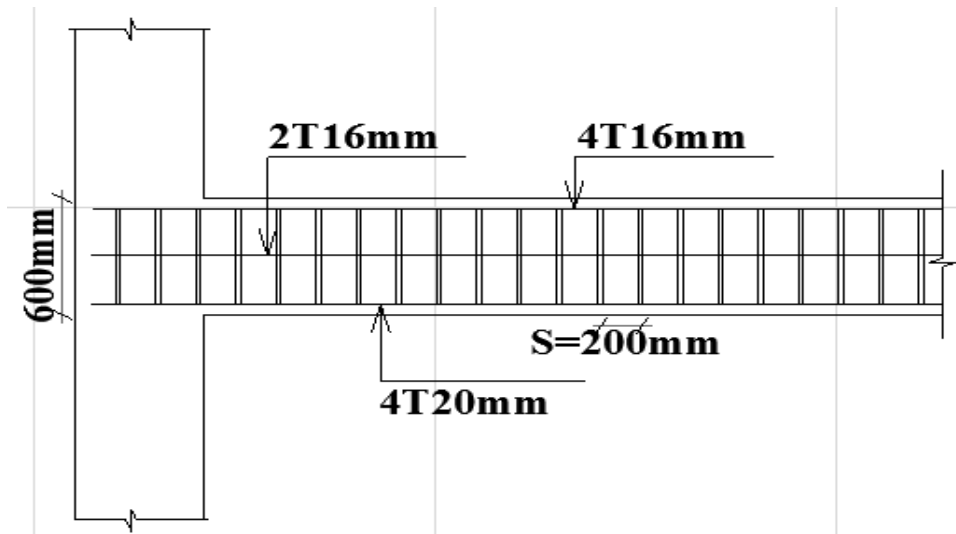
23: Longitudinal section of the steel reinforcement of the beam
